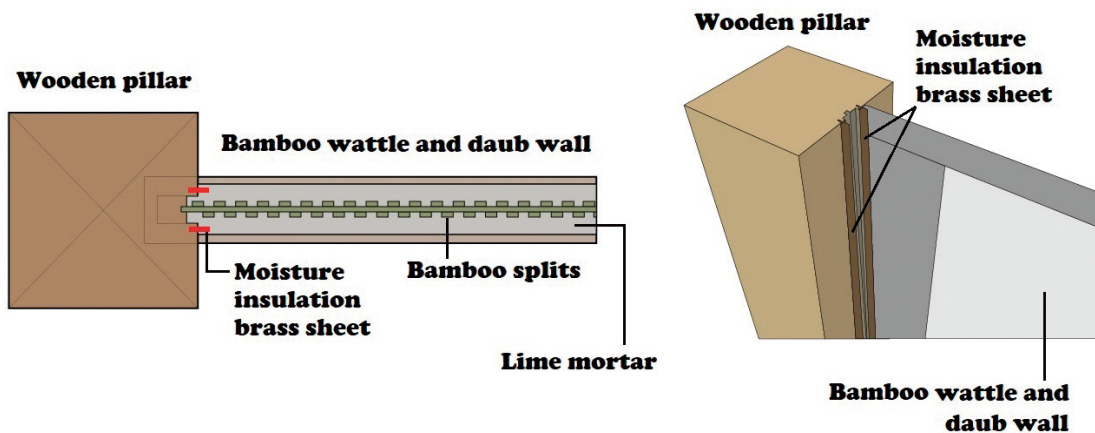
The moisture insulation mechanism between bamboo wattle and daub walls and timber structures (drawn by Queenie Lin).
